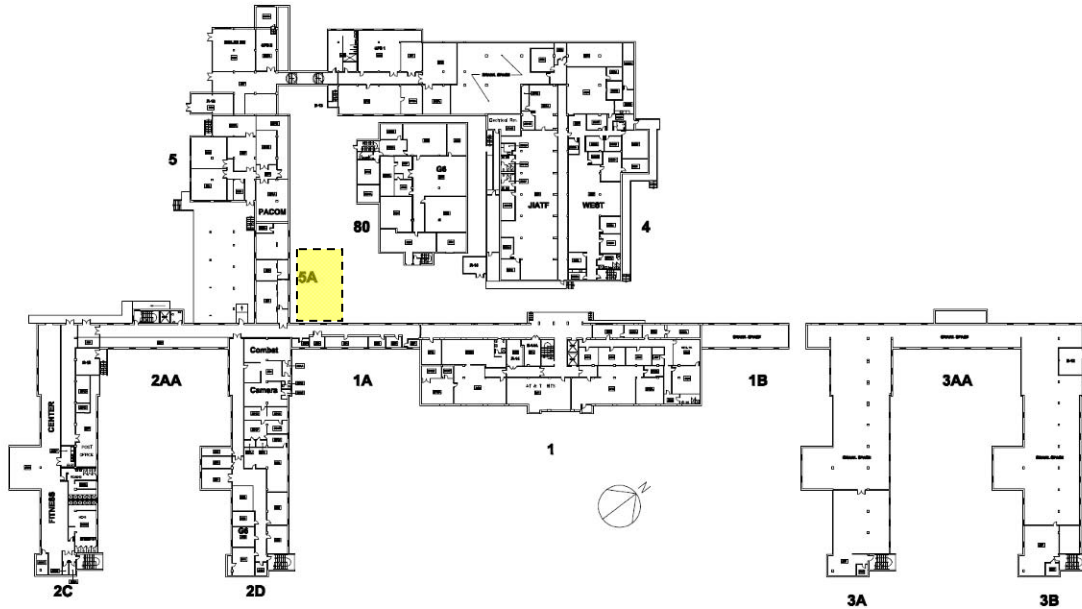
Building 80 (right side) and Building 5 (left side)
